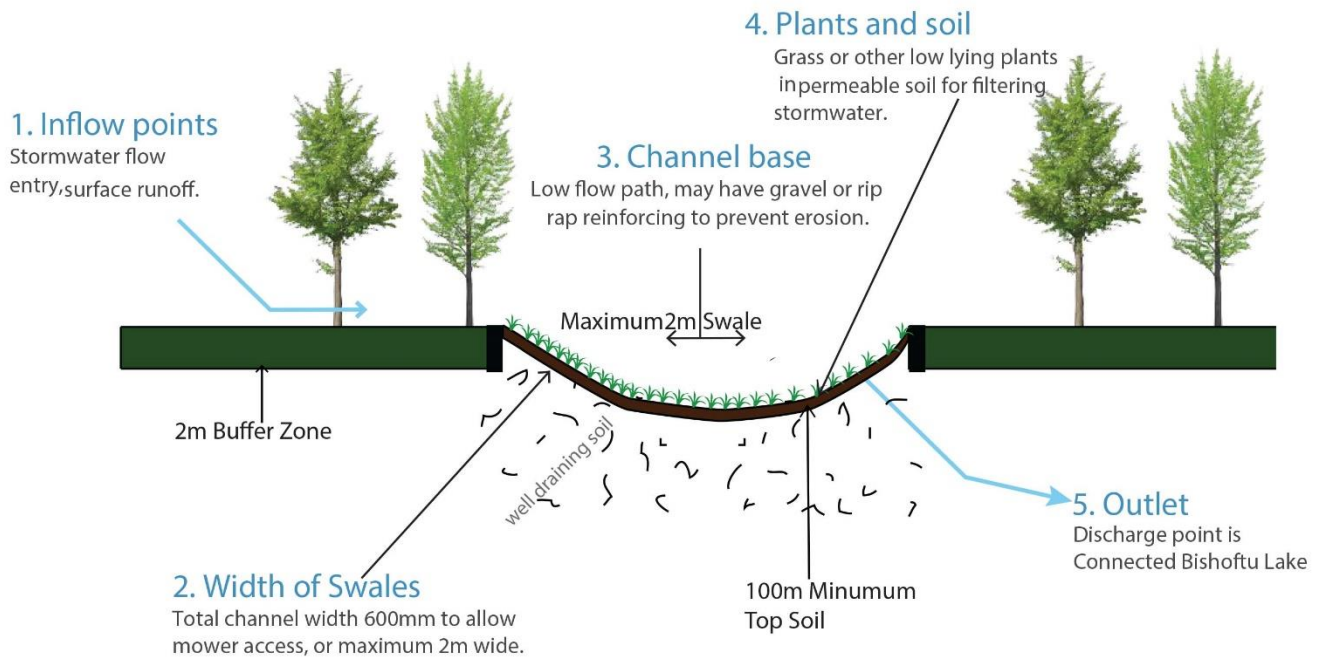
Non- Paved Drainage Line Design Intervention for the Case Site
